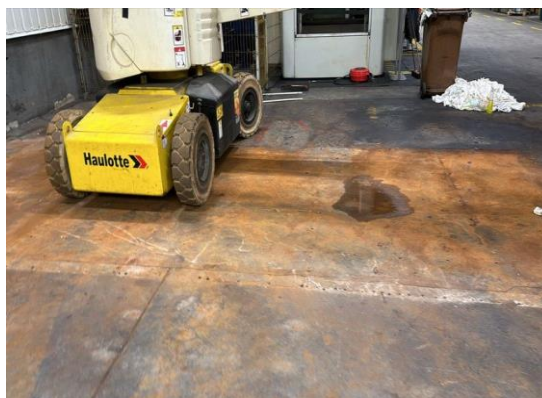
Concrete industrial floor (Example 2) before repair: after removal of steel plates, visible rust mashing and discoloration [38]
